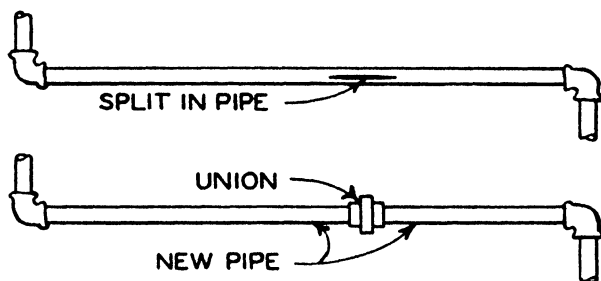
A broken pipe repaired with new pipe and a union.
